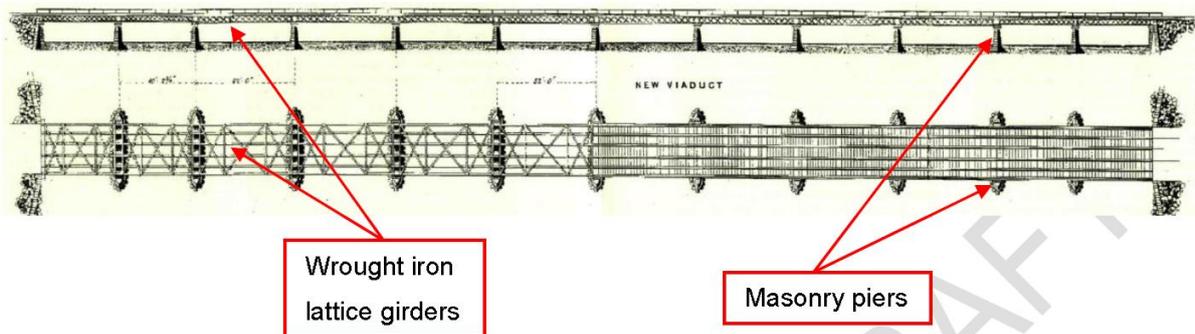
New masonry and wrought iron Malahide Viaduct constructed in 1860
